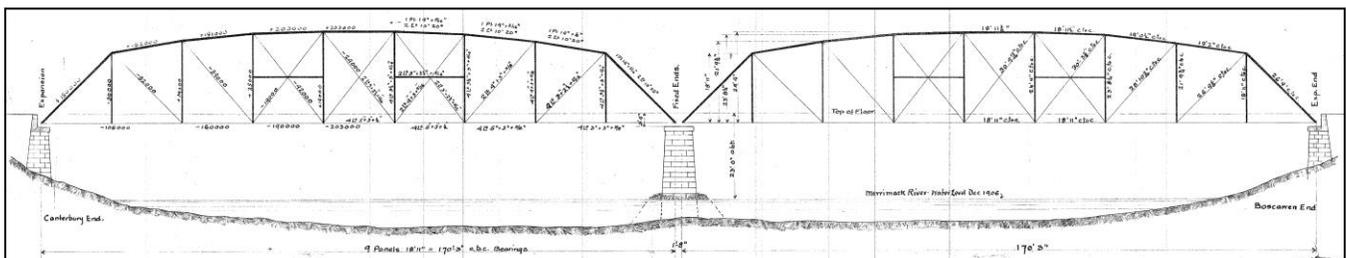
Boscawen-Canterbury 132/085 (1907). Clip from original plans by John Storrs, sheet 1 of 4, 1907 (NHDOT Plan files).
